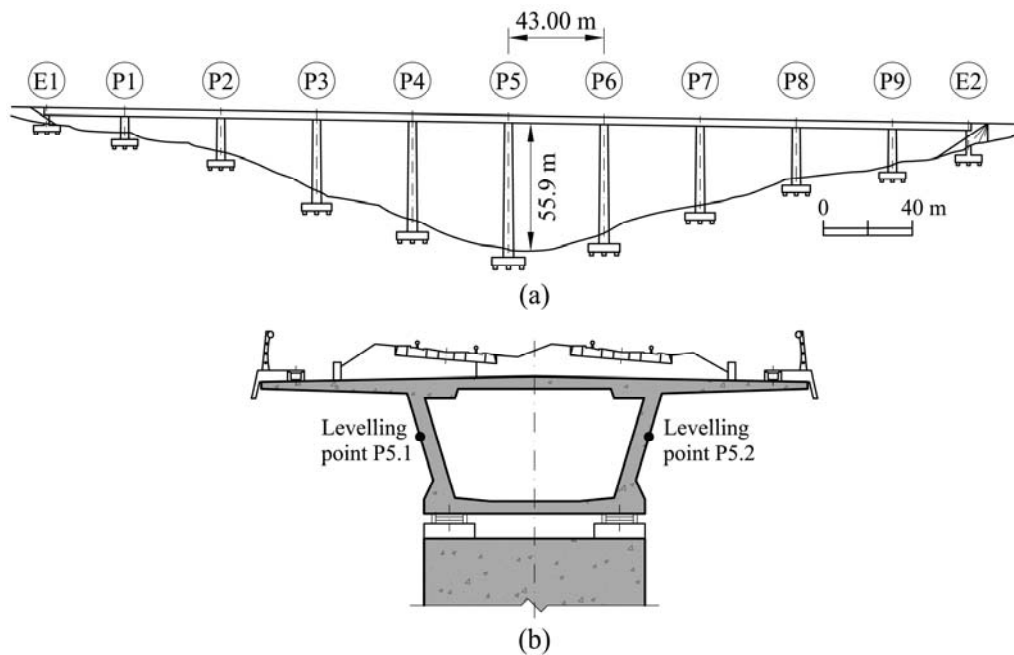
Pont de Candí viaduct: (a) longitudinal section; (b) cross-section
